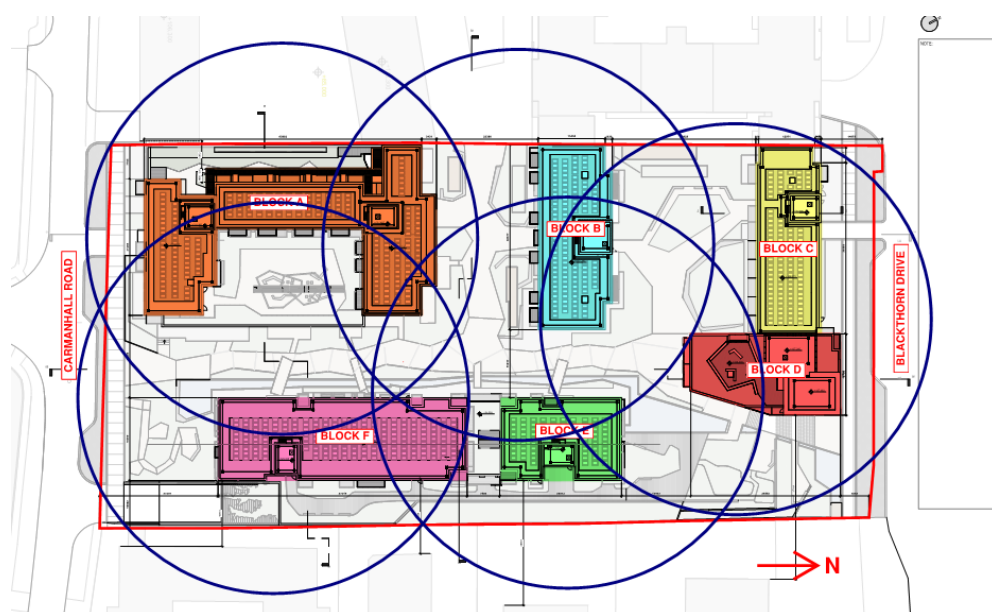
Outline Tower crane positions and lift radius (40-50m job length)
